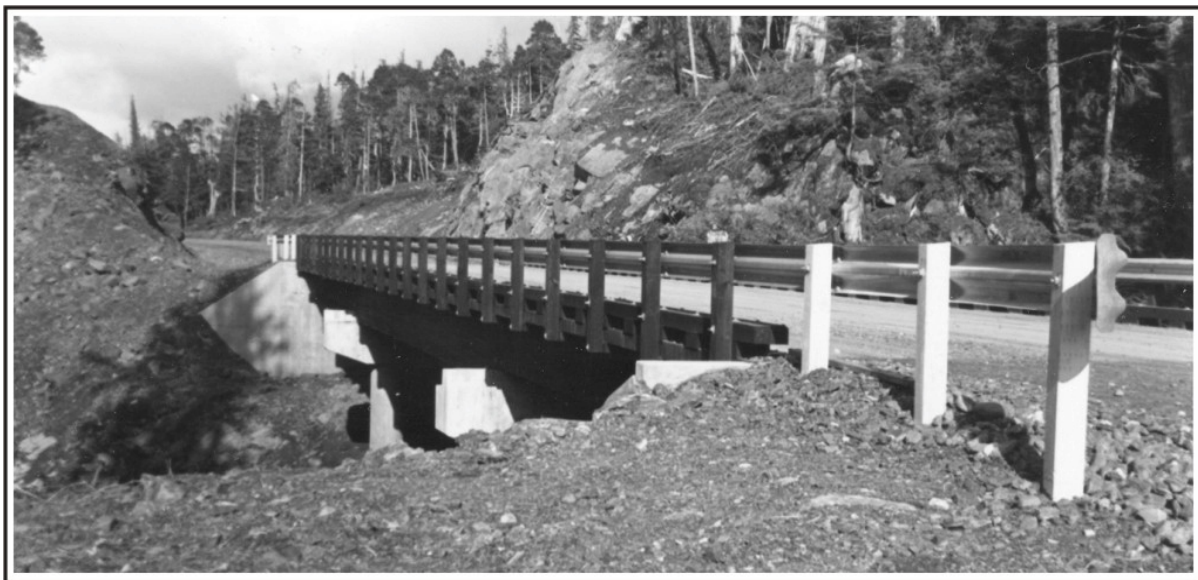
The Paul's Creek Bridge on the Naknek-King Salmon Road, August 4, 1962. Photograph by George Whiteley, ADOT&PF Bridge Section, Juneau.
